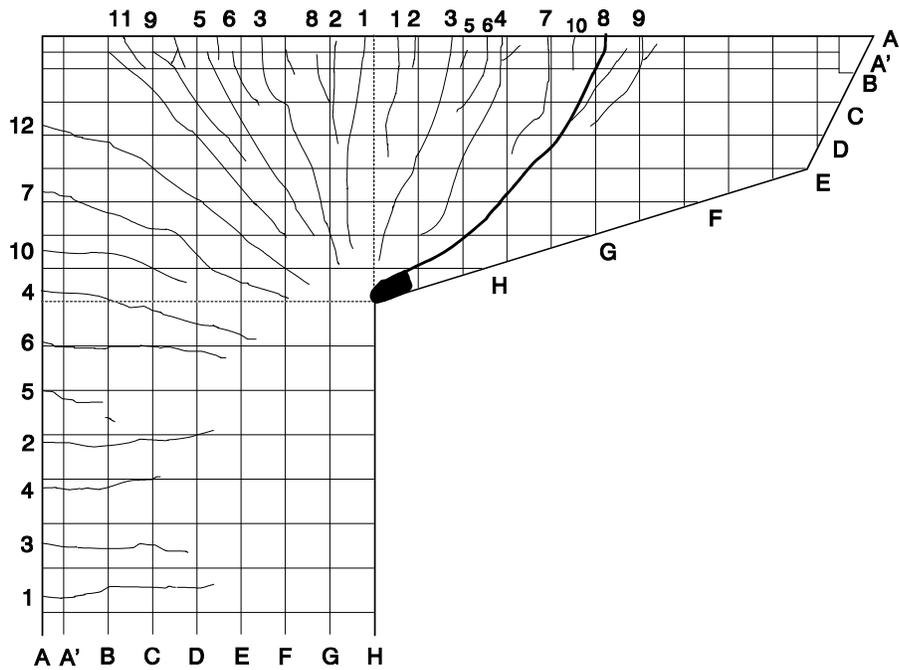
Cracking pattern on north face of Specimen POJ-PU-54-TH at failure
